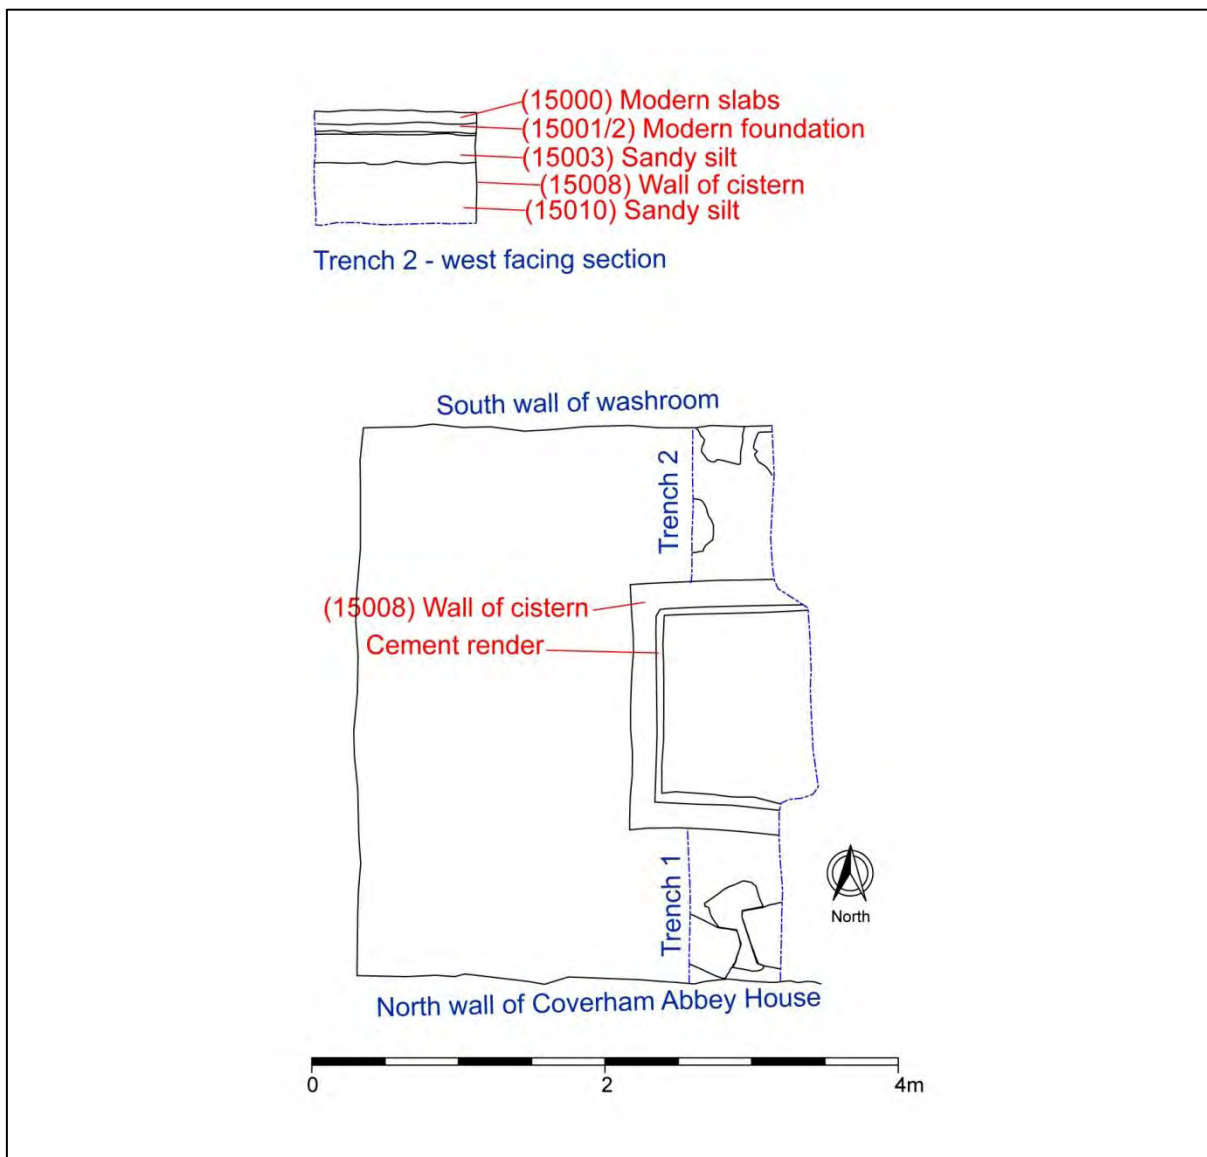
Porch Area 2014/5 watching brief section (top) and plan (below)
